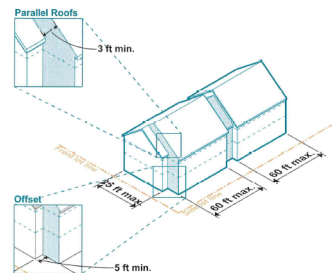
Facade Articulation Example for a Building with Parallel Roofs
